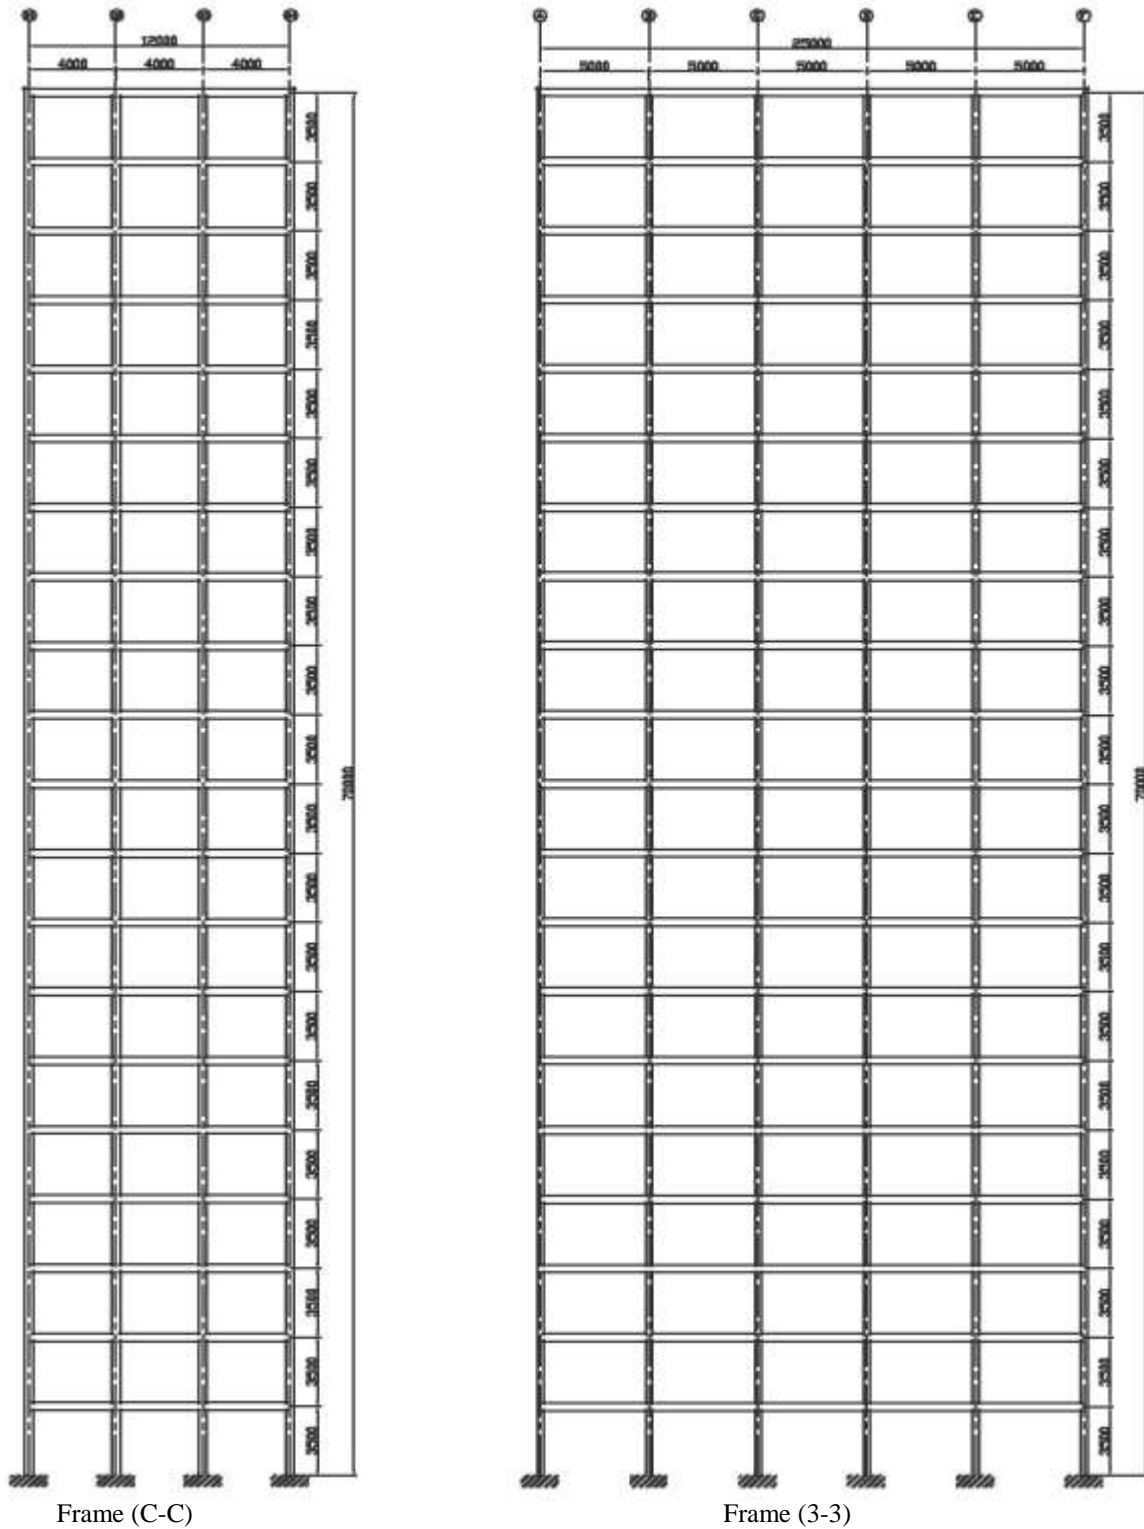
Frame (C-C) and (3-3) Of twenty-story regular R.C. building (all dimension in mm)
